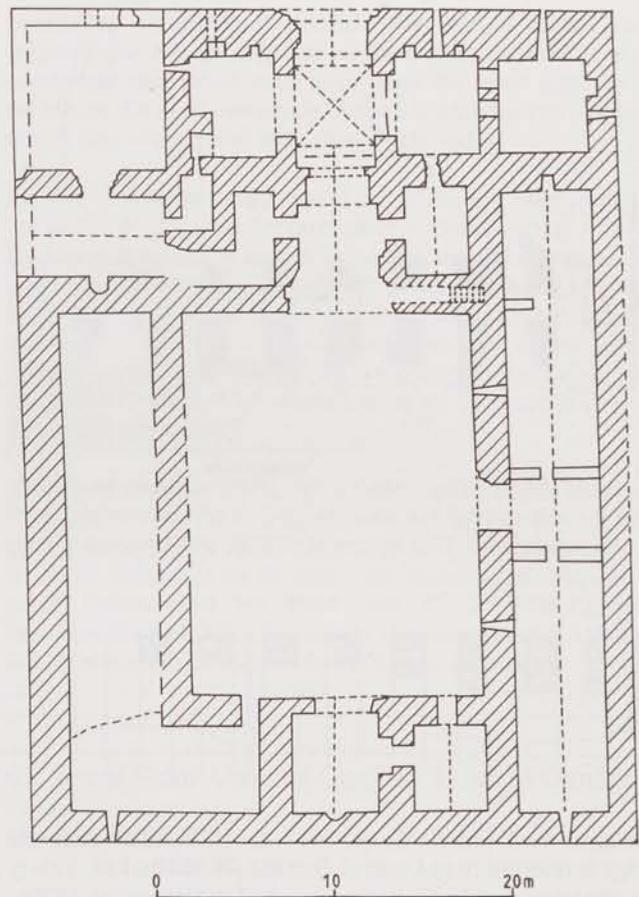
Jubb Yūsuf (No. 68). Plan of khān.
